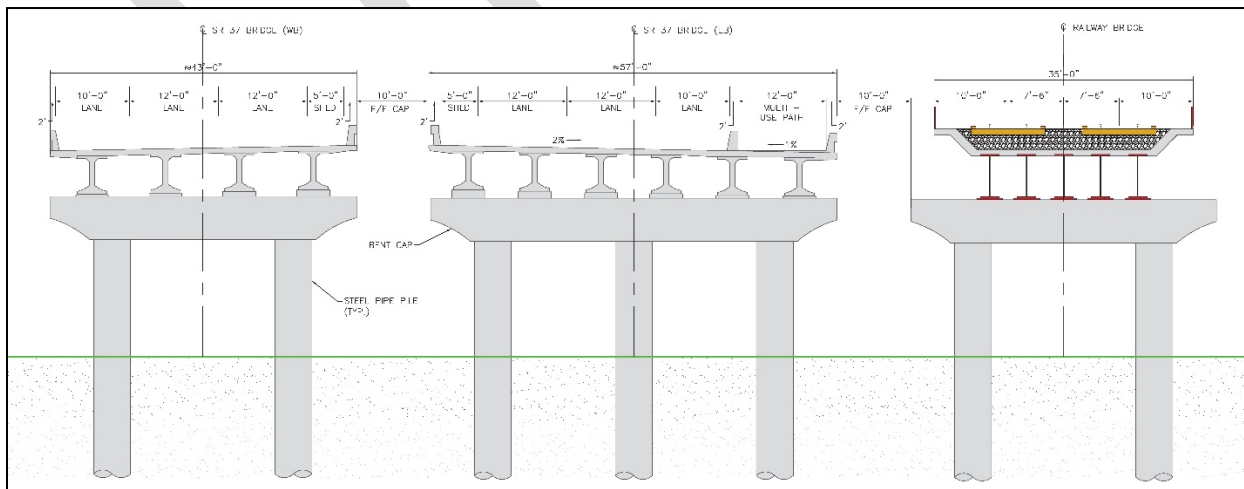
SR 37 Segment A Combined Highway and Rail Elevated Section Looking East
